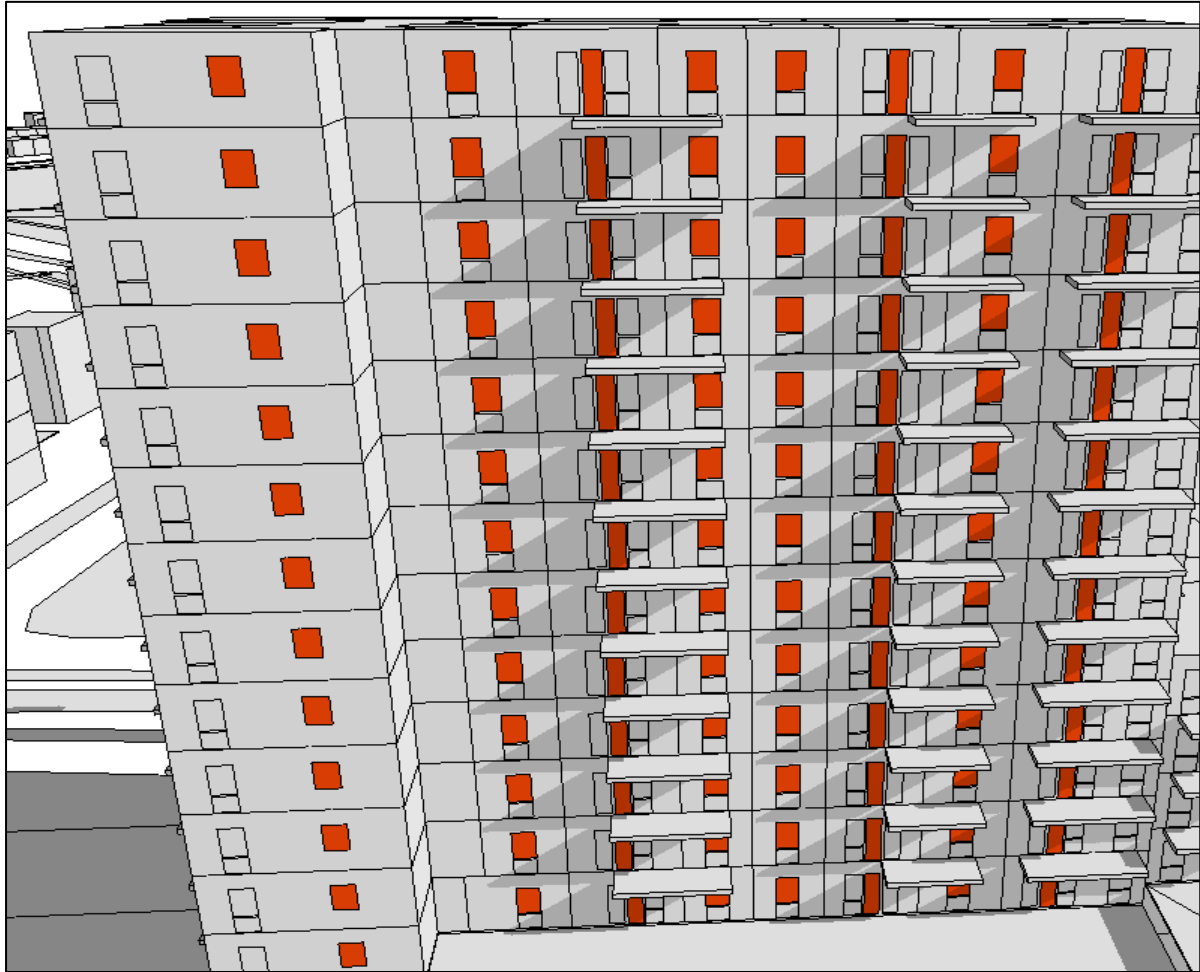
Windows achieving 1.5 hours of sunlight - Southwest elevation of Building 2B (modelling software)
